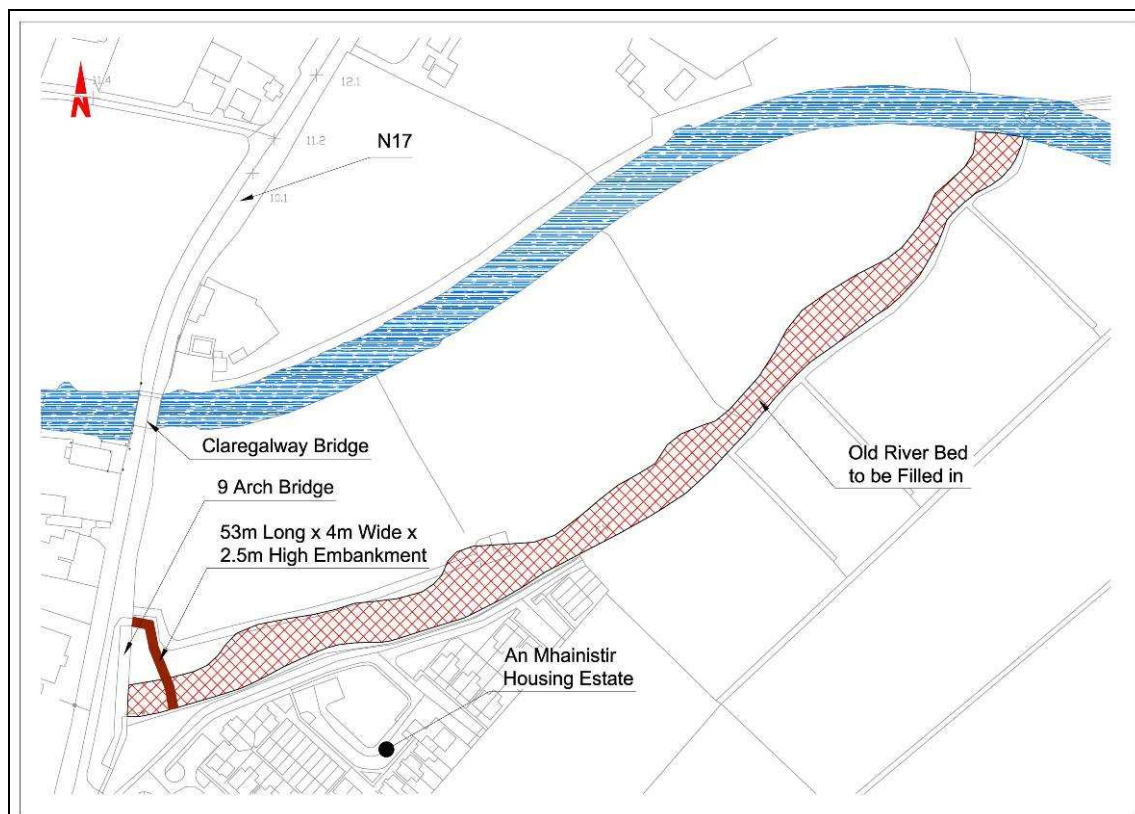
Embankment at Nine Arches Bridge and Infilling of Old Clare River Channel
